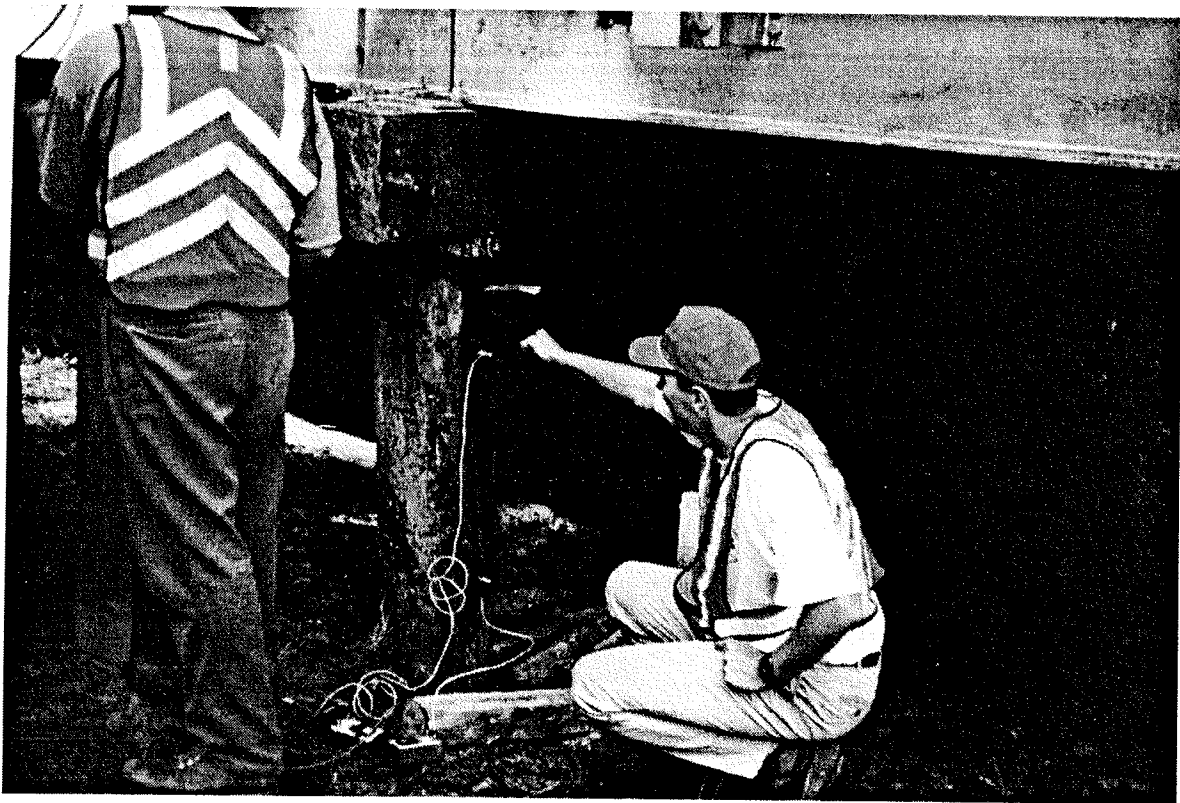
Photograph of Bent 1, Johnston County Bridge # 33, North Carolina.
